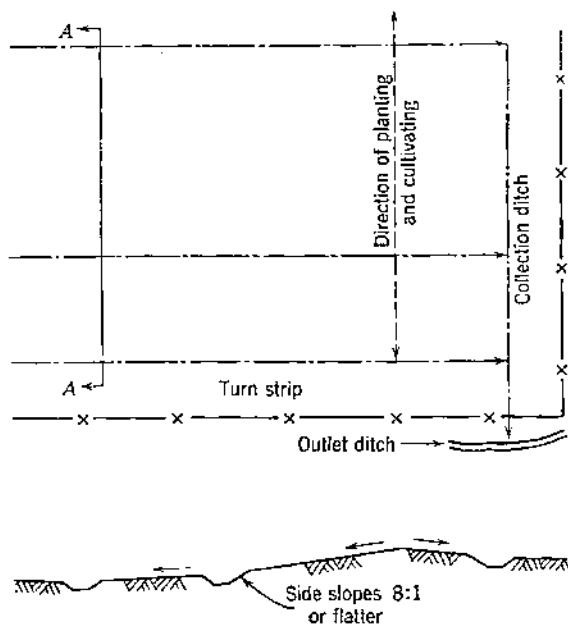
Parallel field ditch system of surface drainage. (Adapted from Beauchamp.³)
